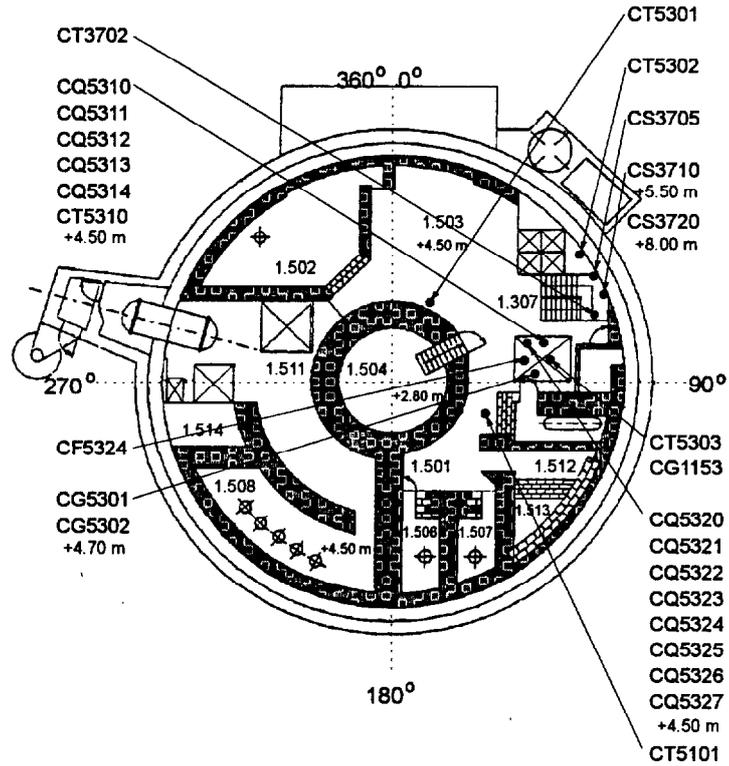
Level 1.500 at the +6.0 m Elevation for T51.19
